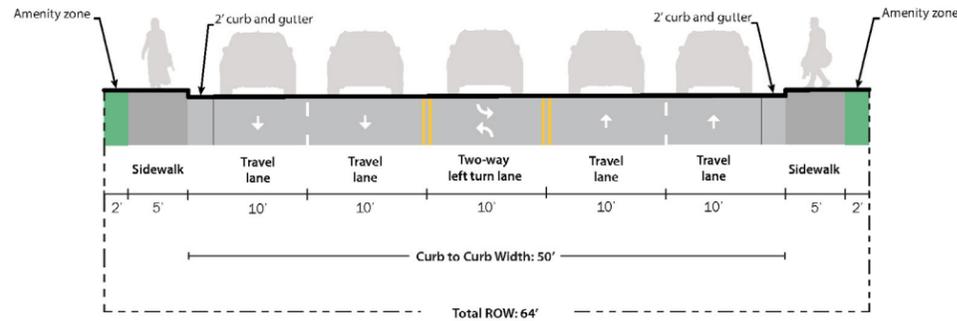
Section H (72nd Avenue West of Julian Street – Looking East)
